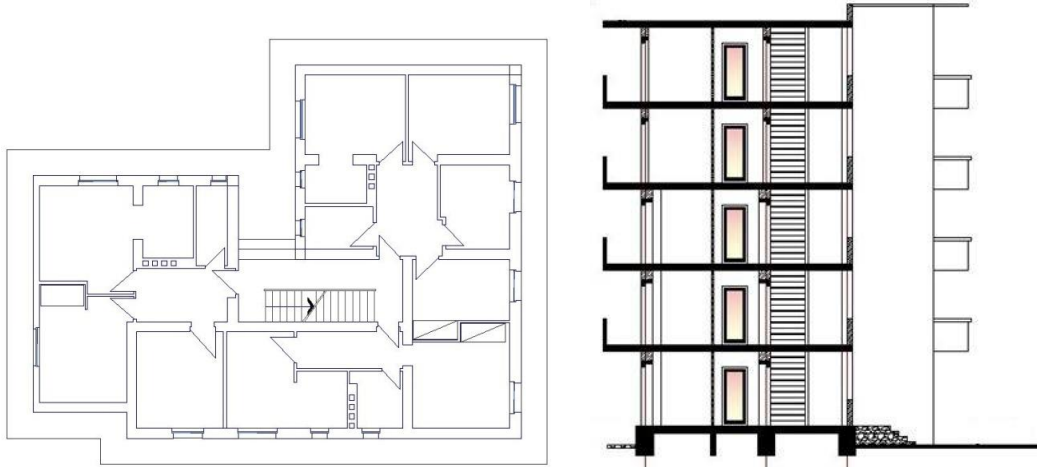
Building C1 plan view and facade view [AQTN, 2018]
